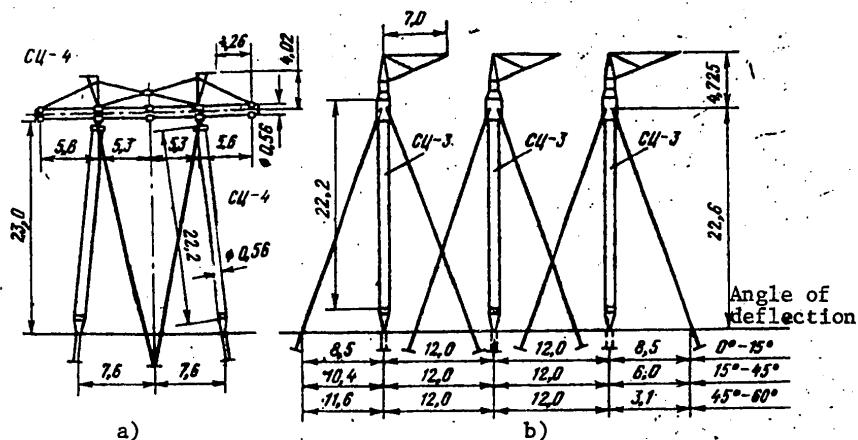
Standardized 500-kV Reinforced-concrete Towers
